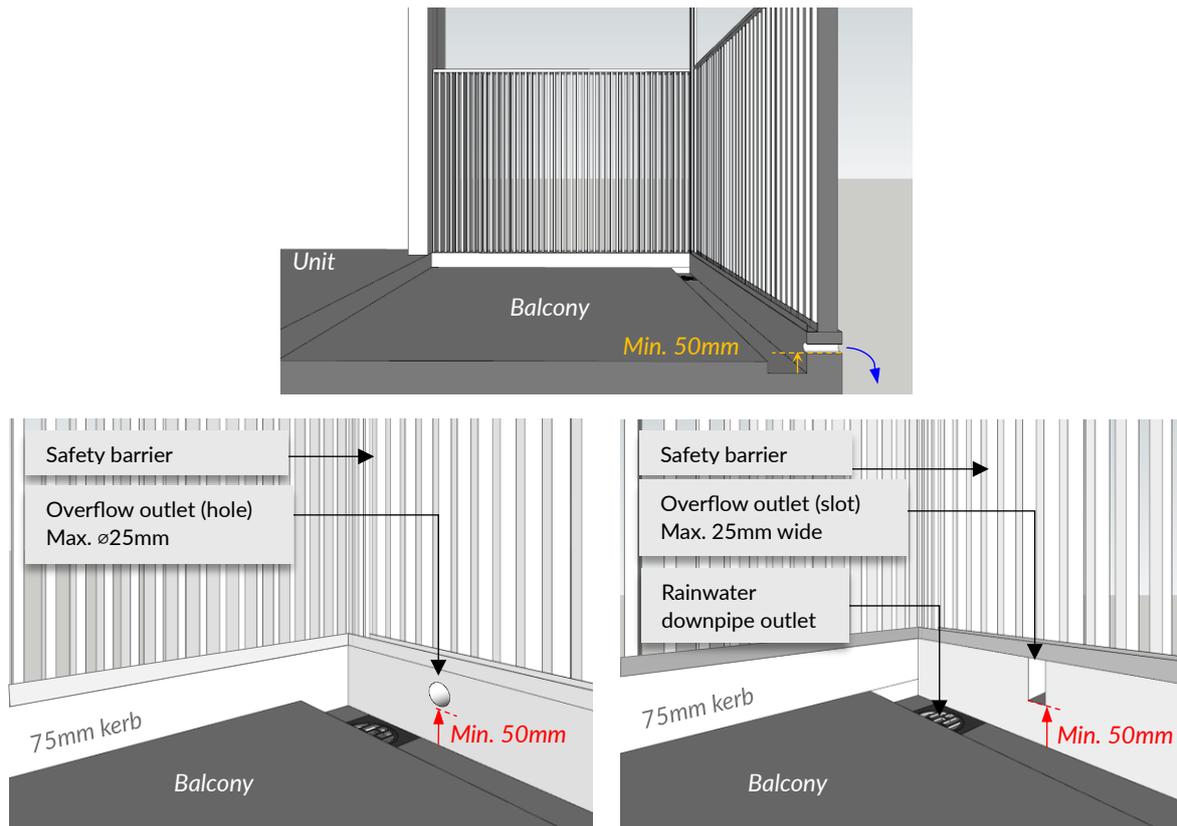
Balcony drainage system with overflow hole or slot as secondary measure to prevent flooding
